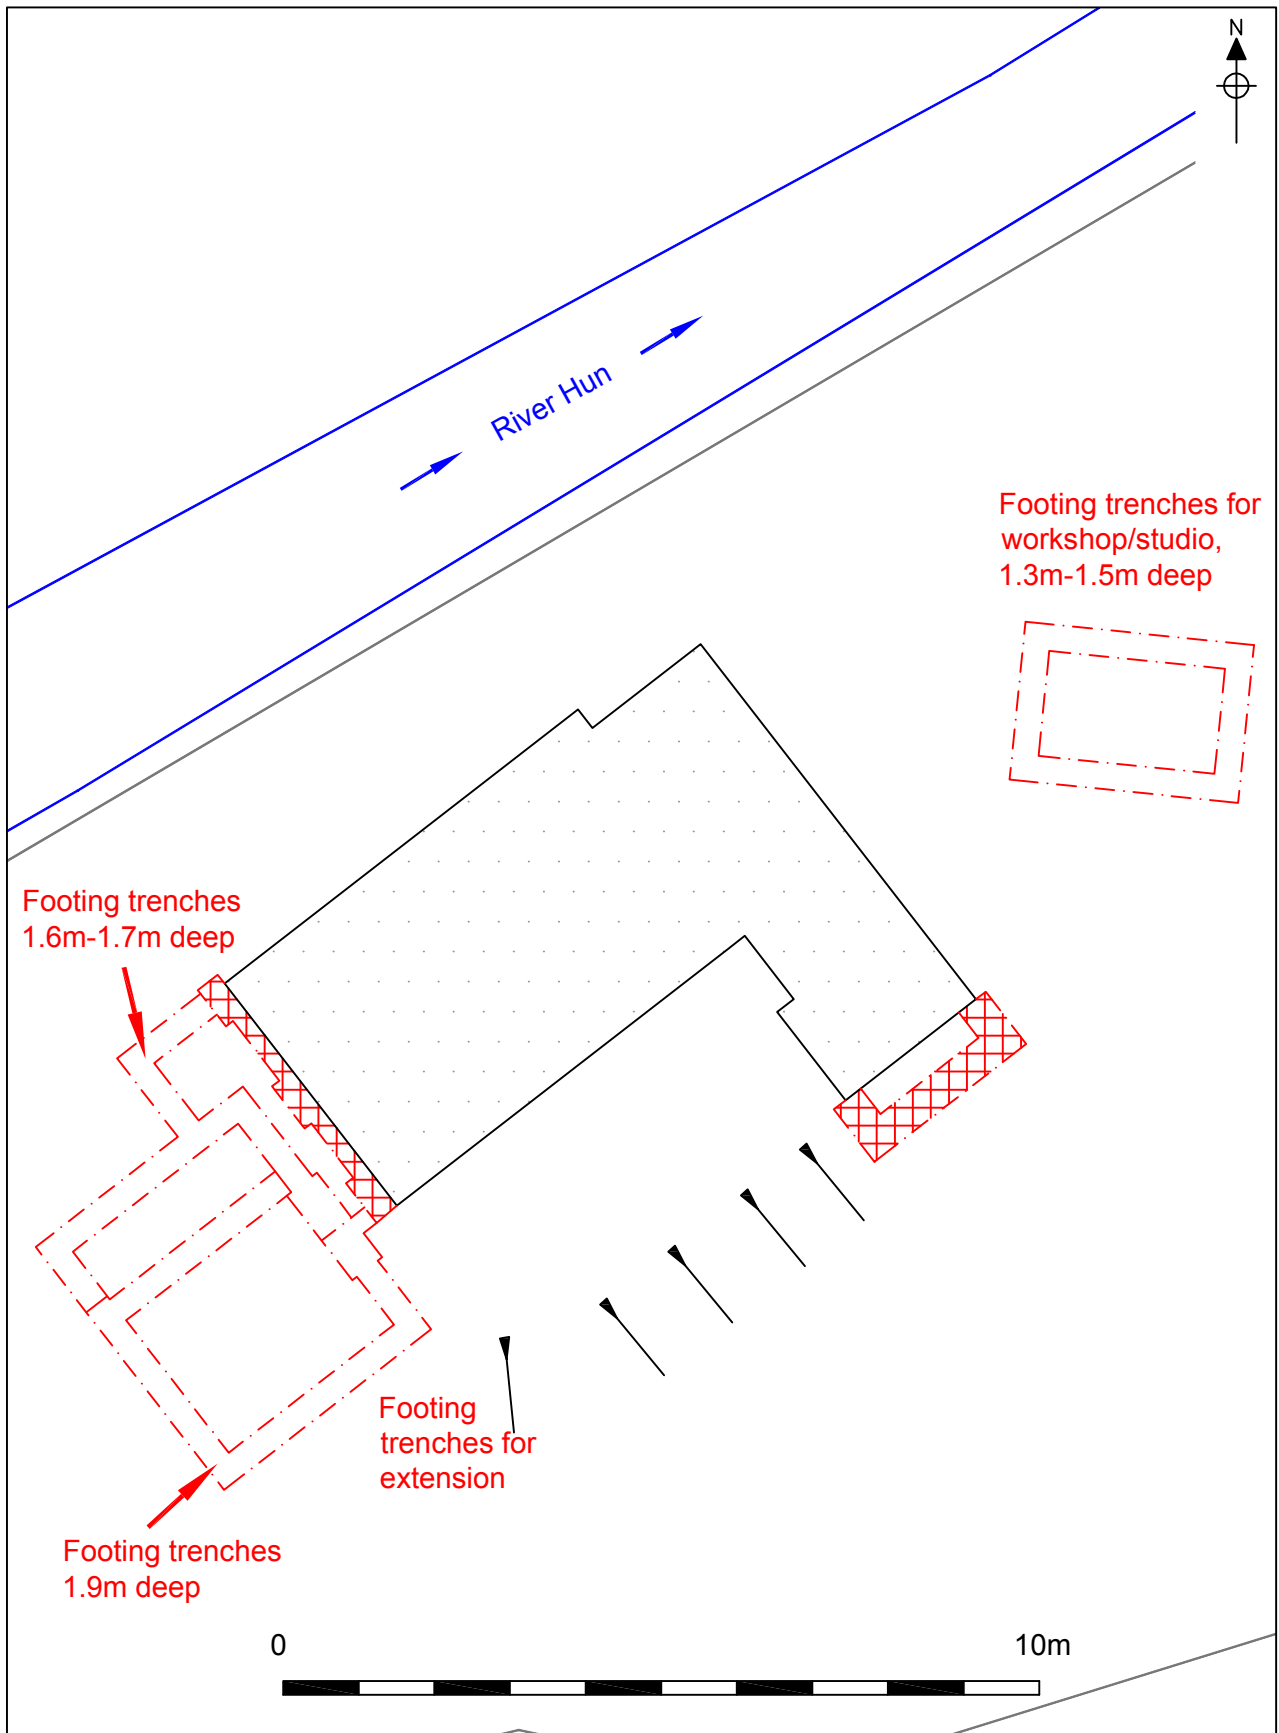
Footing trenches, hatched areas not monitored. Scale 1:200
